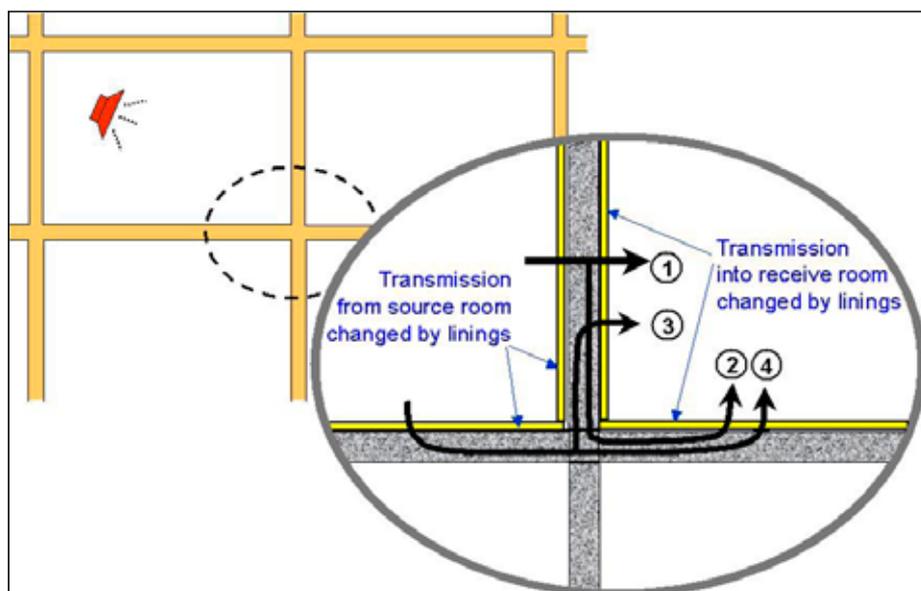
Transmission combines direct path through separating wall (1) and structure-borne flanking via: wall-floor path (2), floor-wall path (3) and floor-floor path (4), plus corresponding set of paths at other junctions. Transmission via these paths is altered by addition of linings in the source room and/or receiving room.
